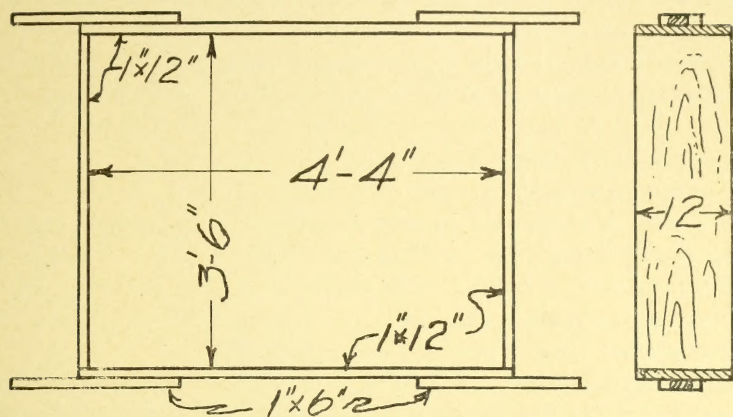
Measuring box for a batch of 1:2:4 concrete containing four bags of cement. Fill level full of stone; half full of sand.
